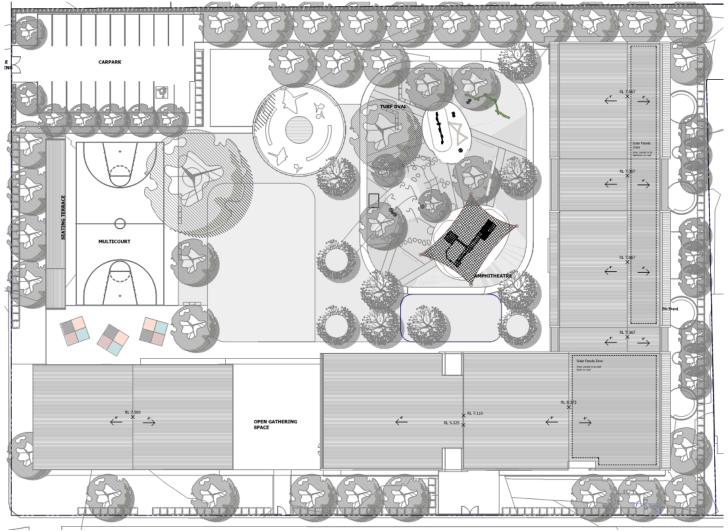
Site Overview cSource: dwp Architectural Concept Room/Site Plan
